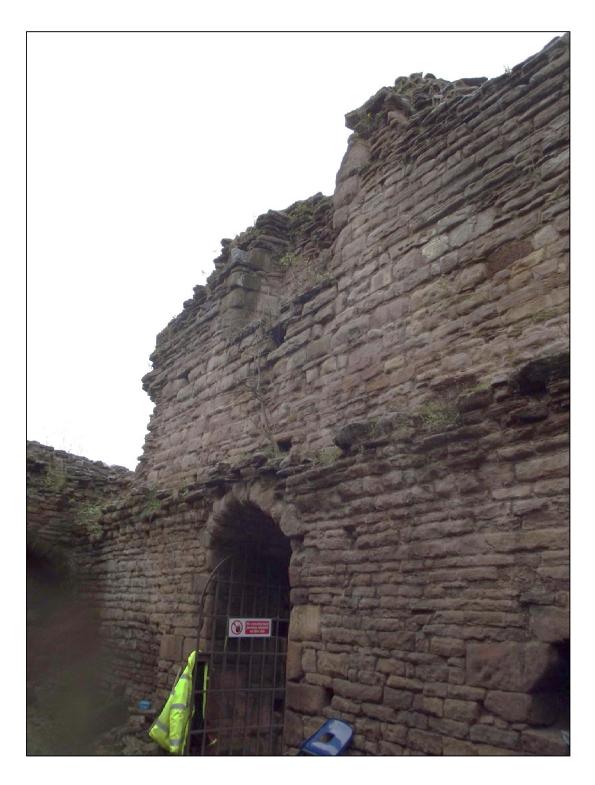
Interior of Radcliffe Tower, looking at the inner western elevation with the remains fo the barrel vaulting and the first floor fireplace.
